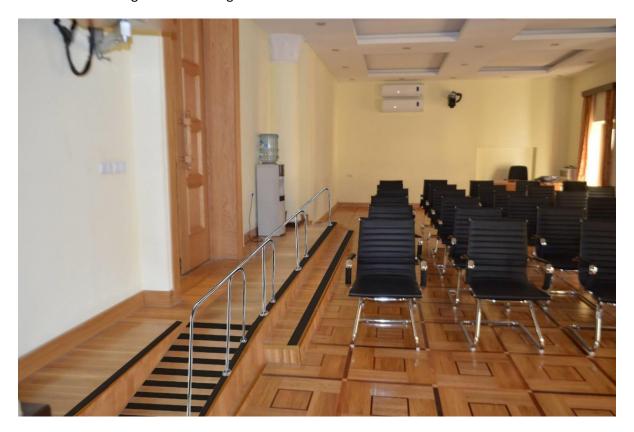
Briefing room with pandus, edges and anti-slips – innovated – project
